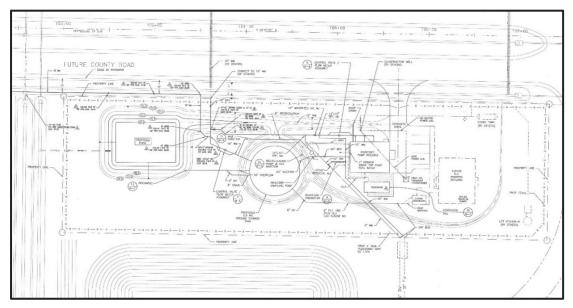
Project Prairie Water Storage and Booster Pump Station System - Yard Piping Plan (Source: TetraTech Record Drawings, July 2006)
